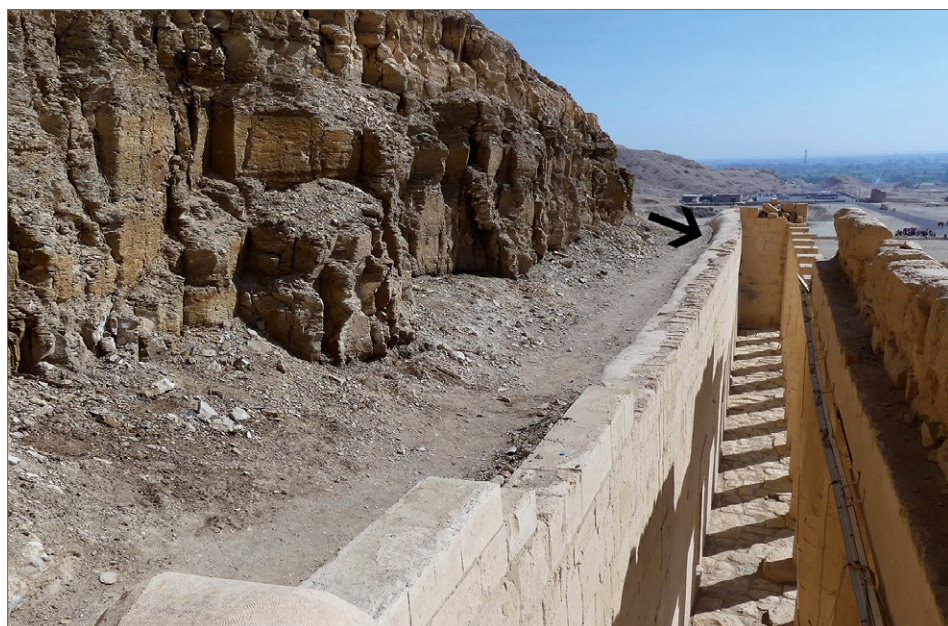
Bulging wall in the Northern Colonnade. The arrow indicates the area of greatest rock pressure. During repairs, the rock along the entire wall length was cut away, and the wall’s structure was reinforced on the rock-facing side (Photo A. Kwaśnica)
